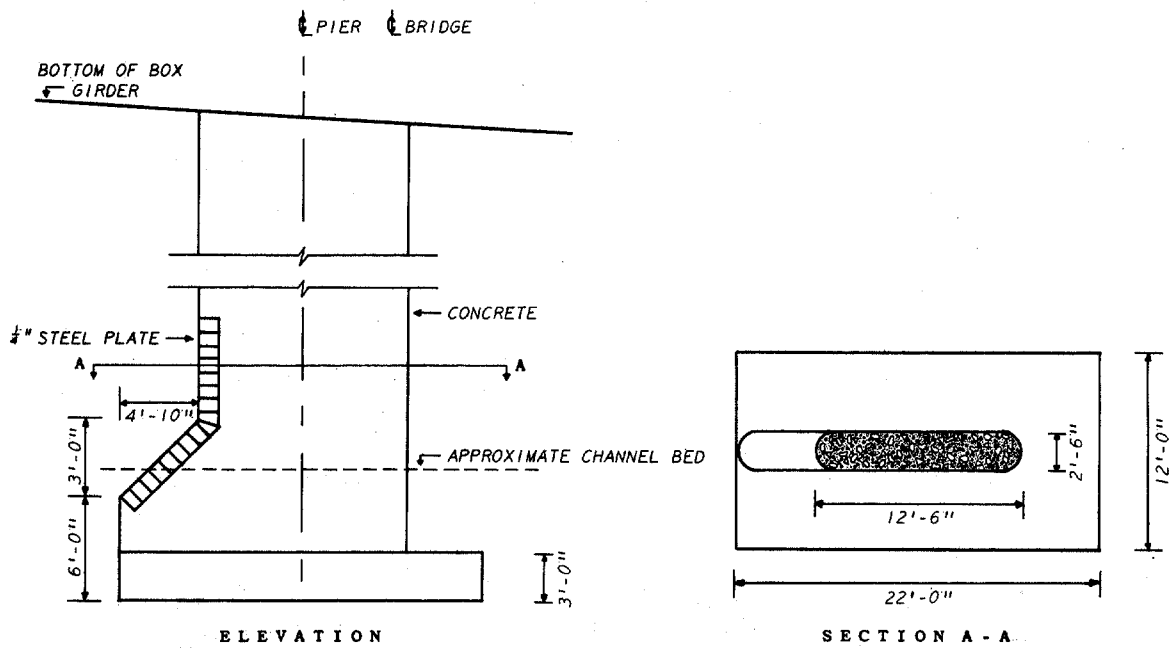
Detail of pier design and armoring, 1964 bridge on Salmon Creek.
